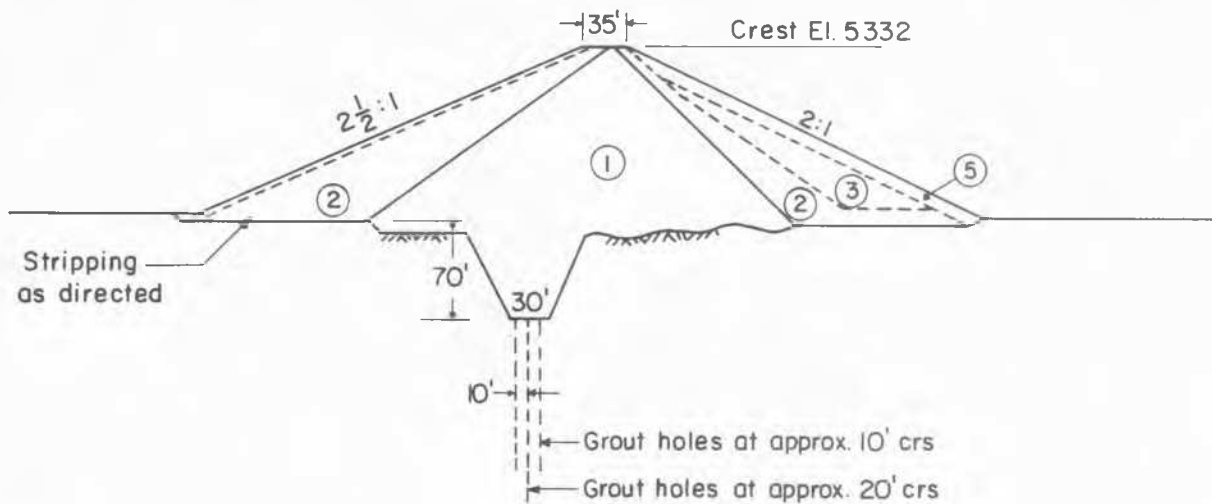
Typical Cross-Section Over Abutment Sections Founded on Jointed Rhyolite
